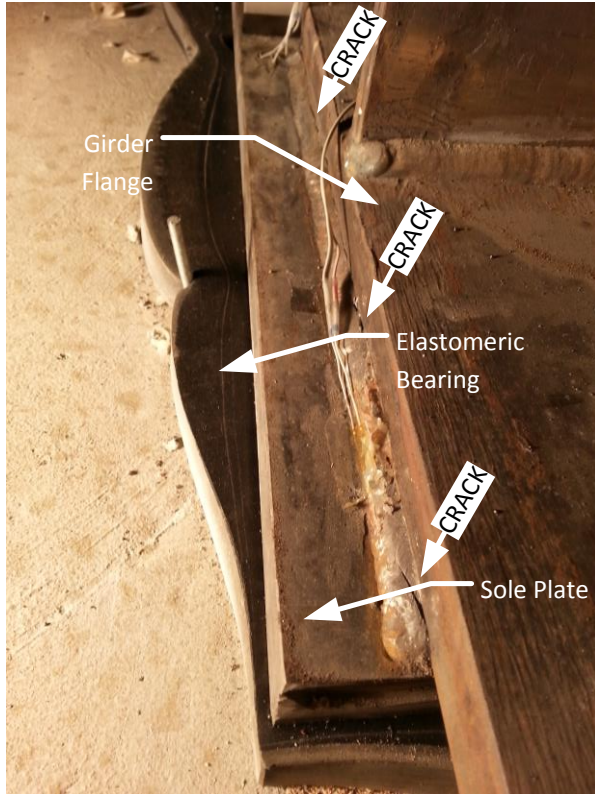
Failed Weld on East Side of North Girder (July 2014)
